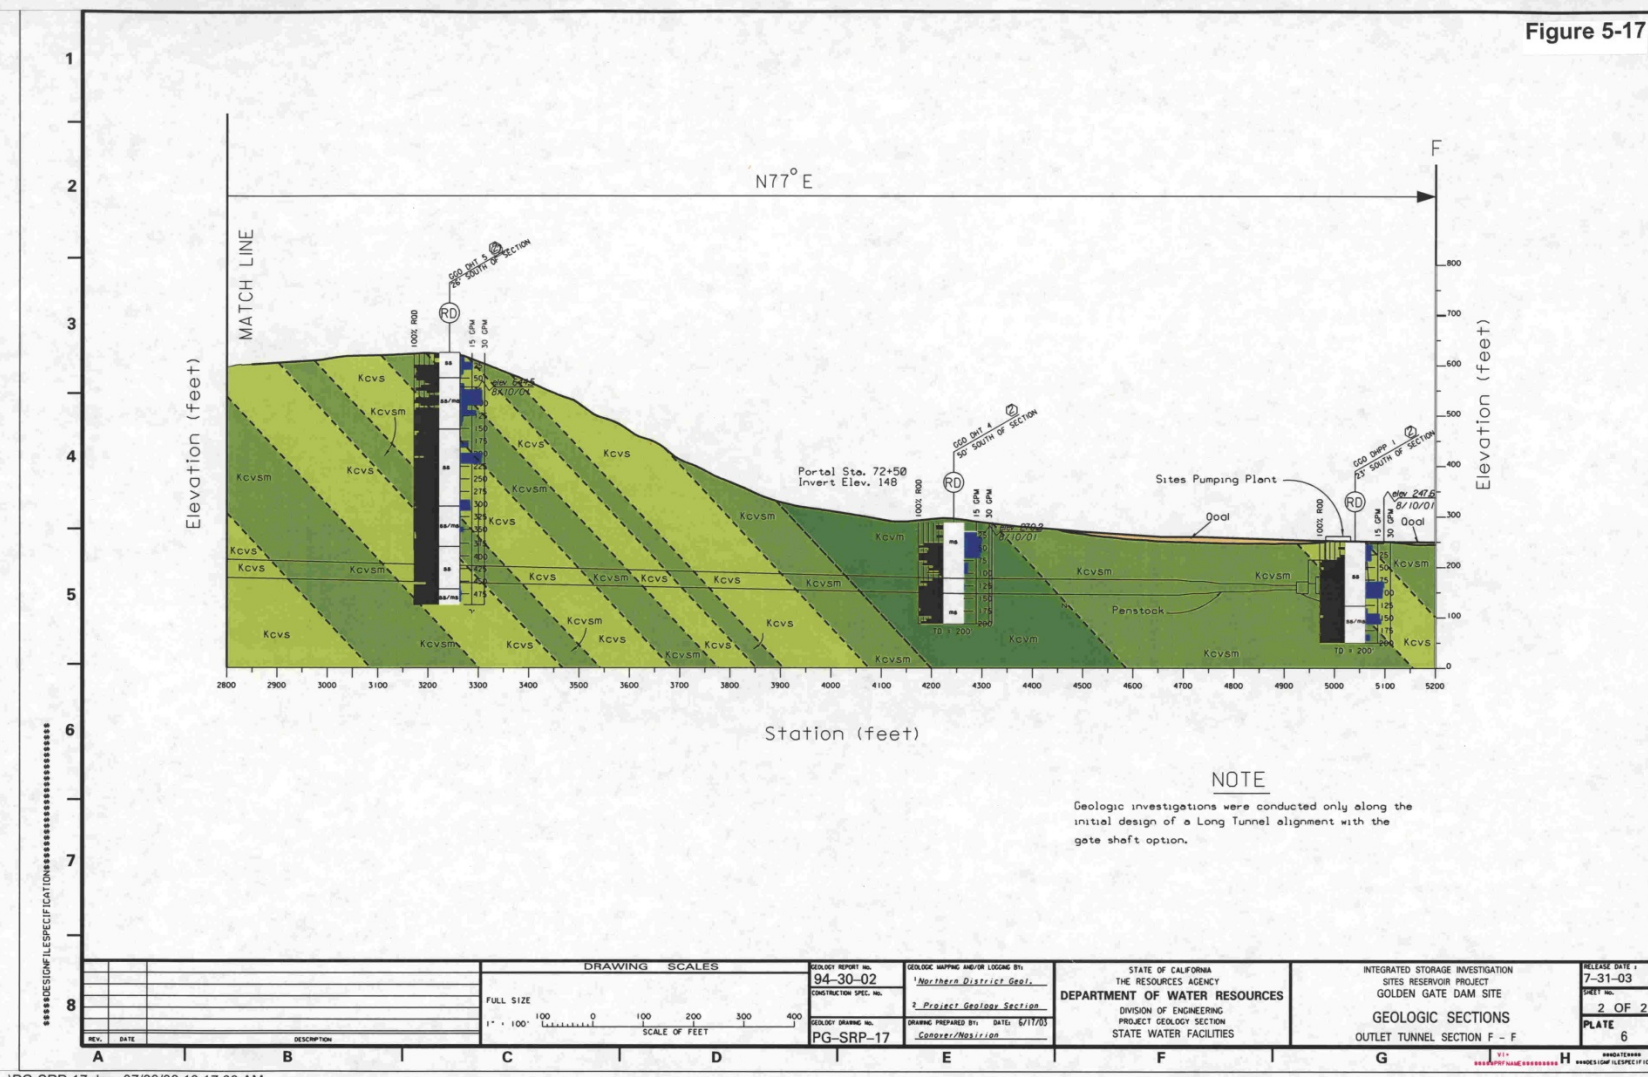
Golden Gate Dam Site – Geologic Sections – Outlet Tunnel Section F-F (Sheet 1)
